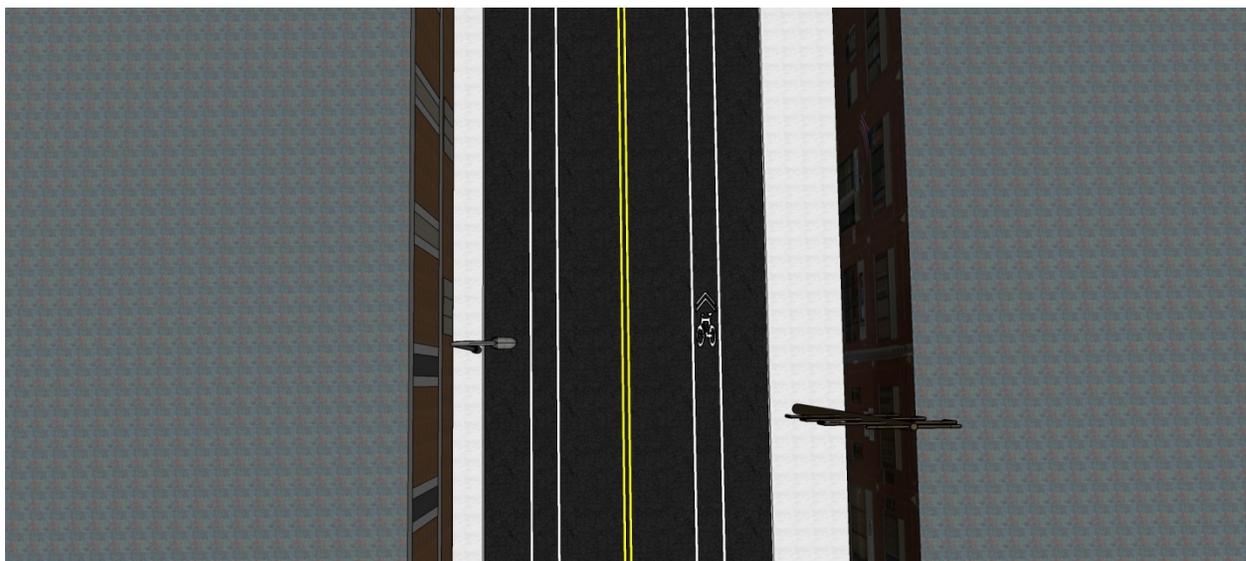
Street layout with all parking maintained between 1<sup>st</sup> ST. SE and E. State St.
